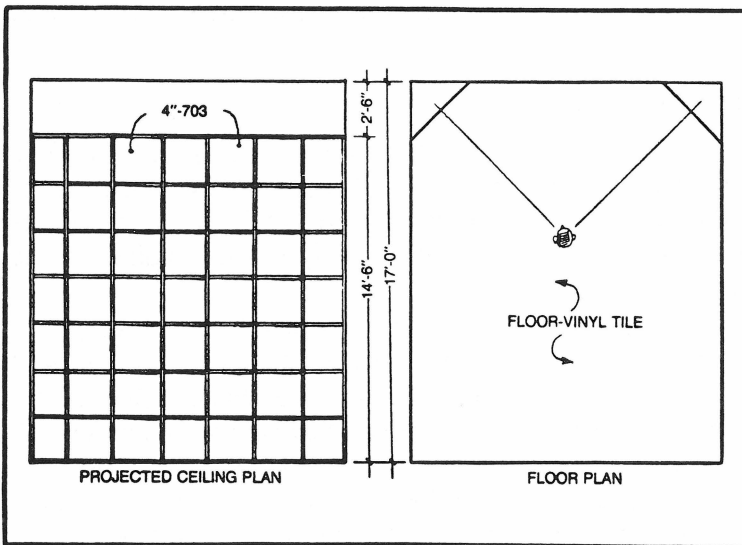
Projected ceiling plan and floor plan of Control Room B.
